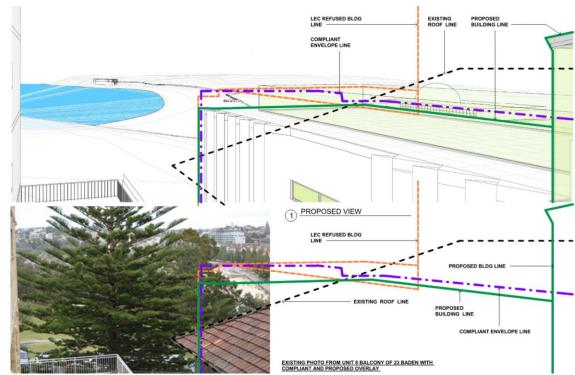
View analysis – 8/23 Baden St balcony – wider view (Source: Legge & Legge Architects)
